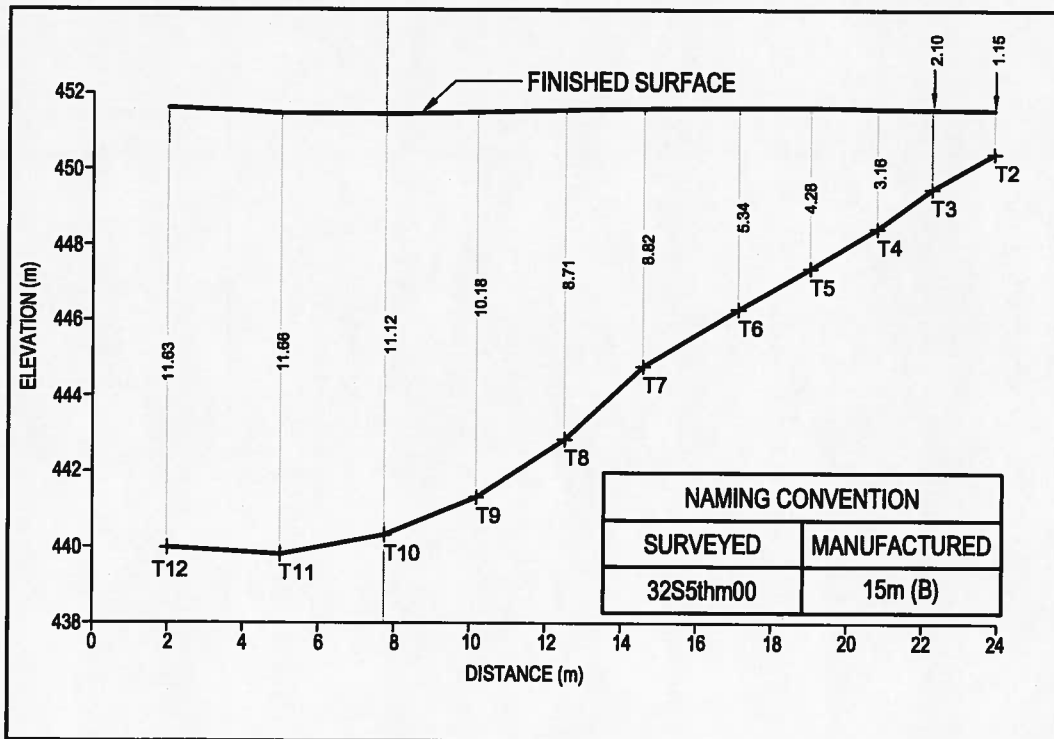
32S5thm00 (15m (B)) - AS MANUFACTURED, PLAN, AND SECTION
